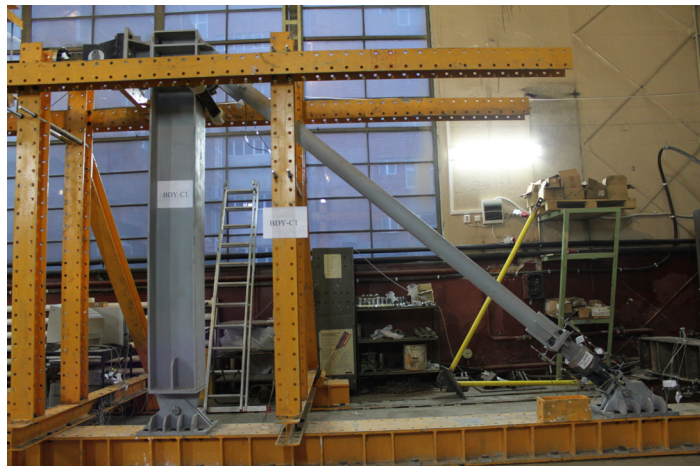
Experimental test setup for CHS brace with damper specimen
